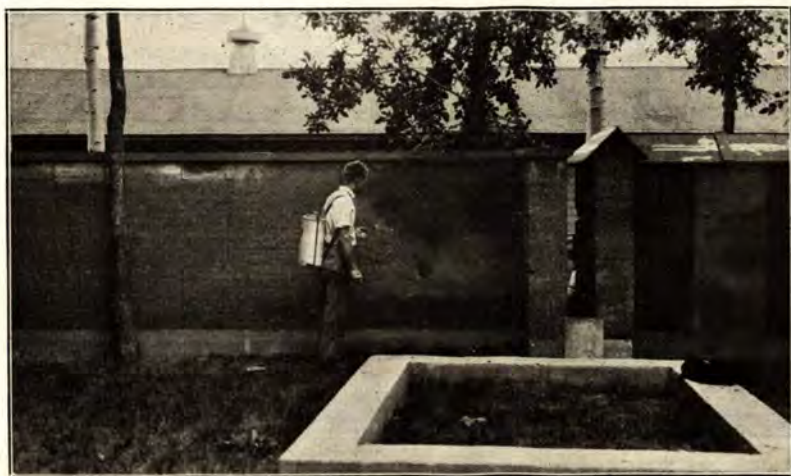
WETTING DOWN A RAMMED EARTH WALL BEFORE PLASTERING.
